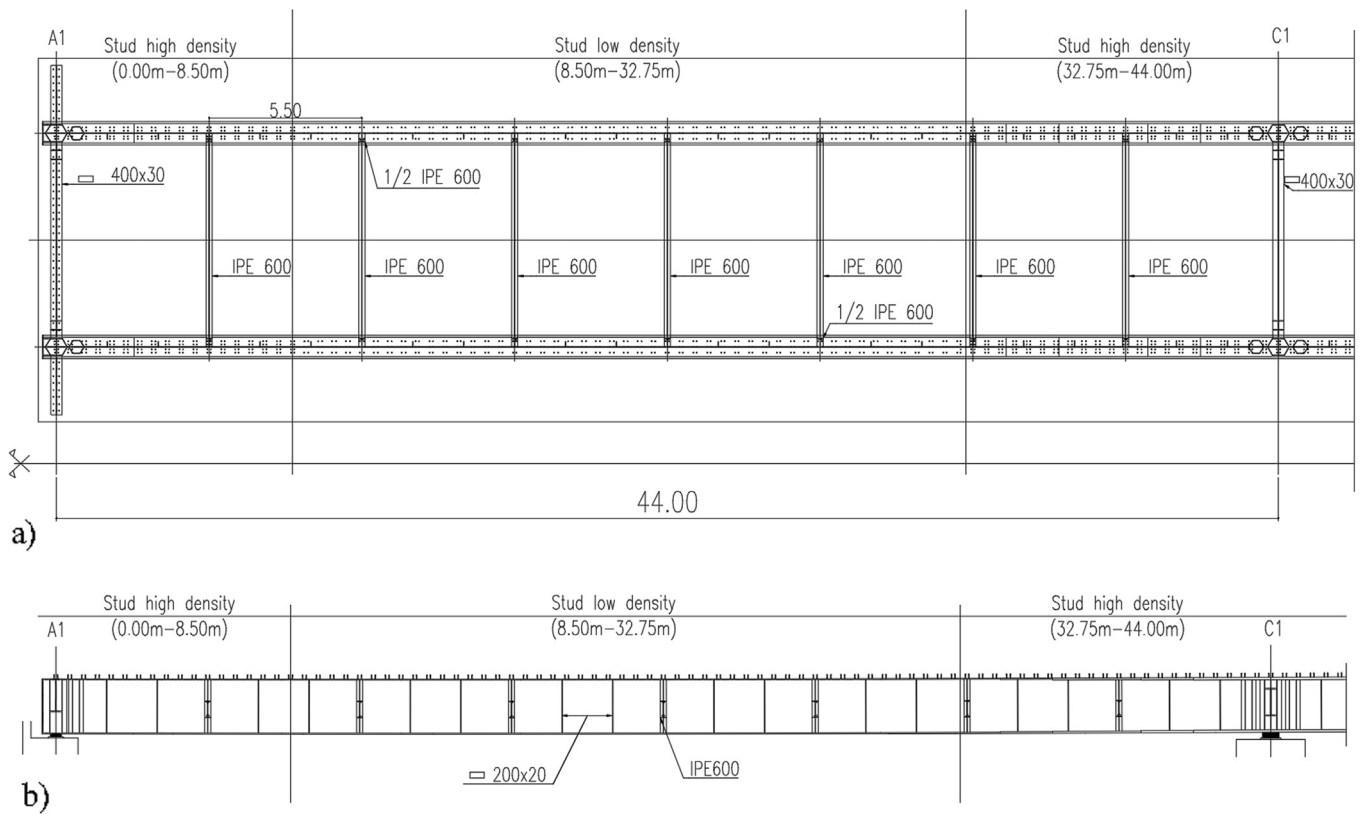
Metallic girders [28]: (a) horizontal plan (m); (b) side view (m).
